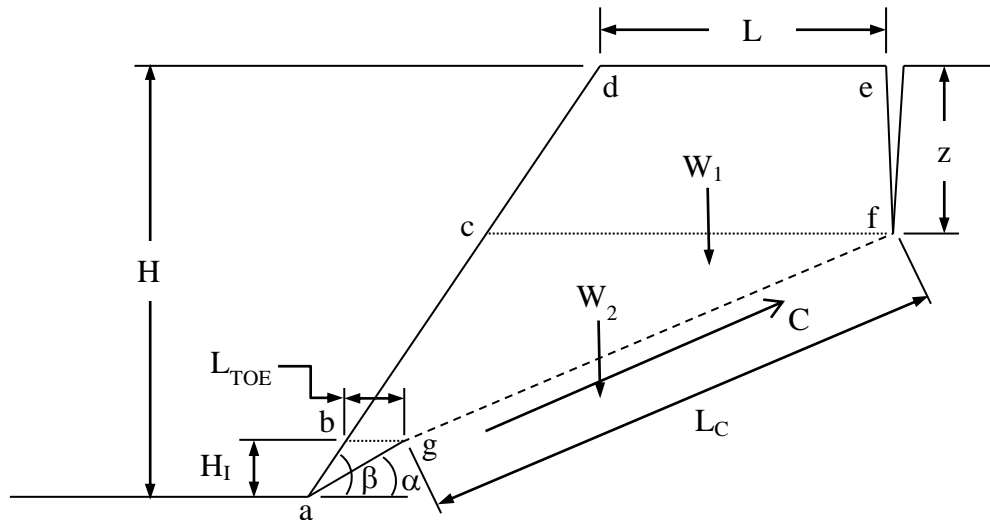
Inclined Slope with Plane Failure Surface and Tension Crack.
